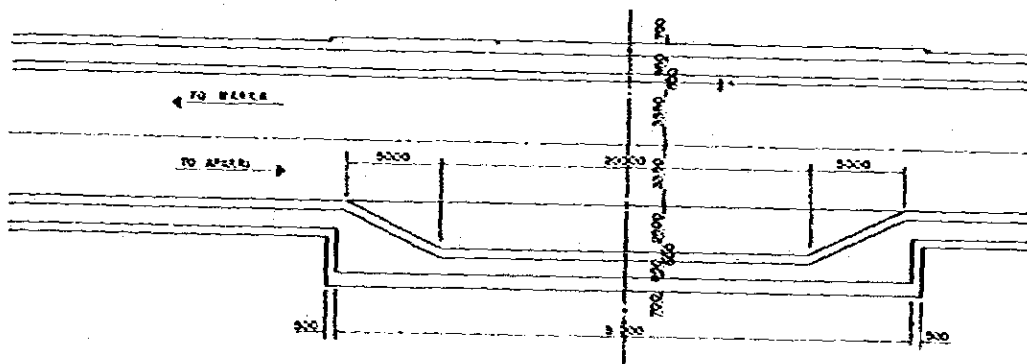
HORIZONTAL LAY-OUT OF EMERGENCY PARKING BAY
